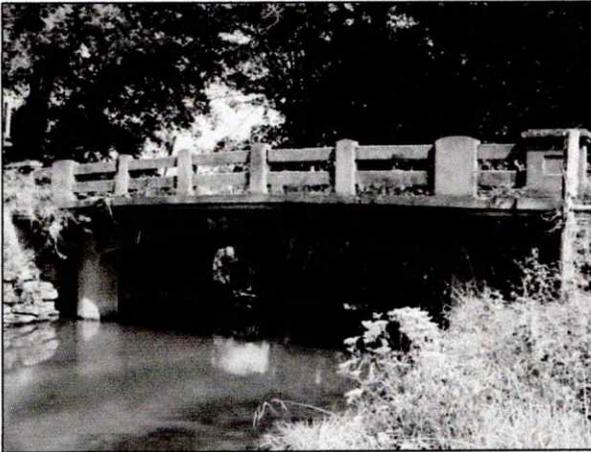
Photograph of a Haunched Girder Bridge in Bradley County, Erected in the 1920s by Steel and Lebbby.
